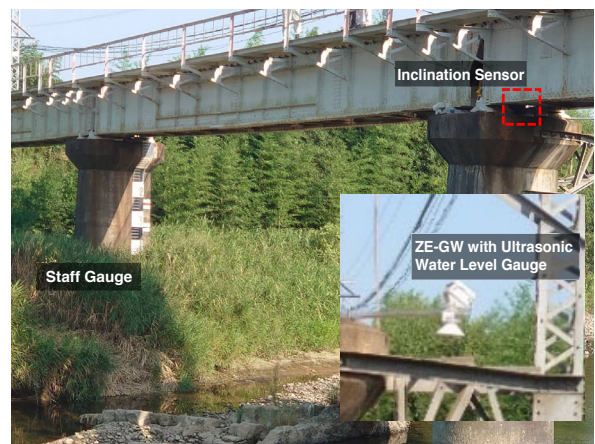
Inclination / Water Level Monitoring of Railroad Bridge Piers
